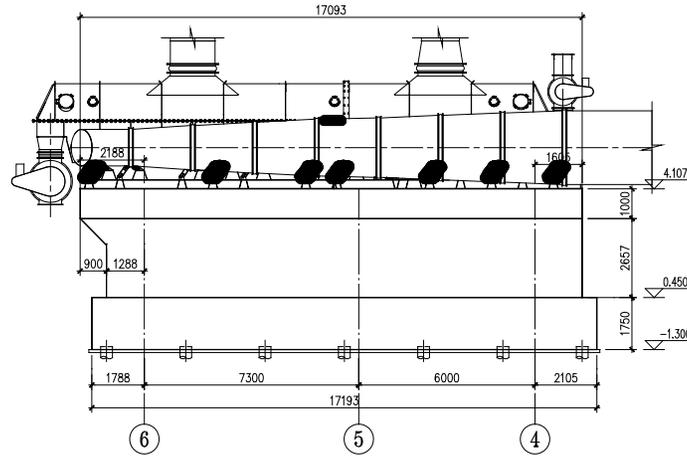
Longitudinal-sectional view of coal dryer foundation.
